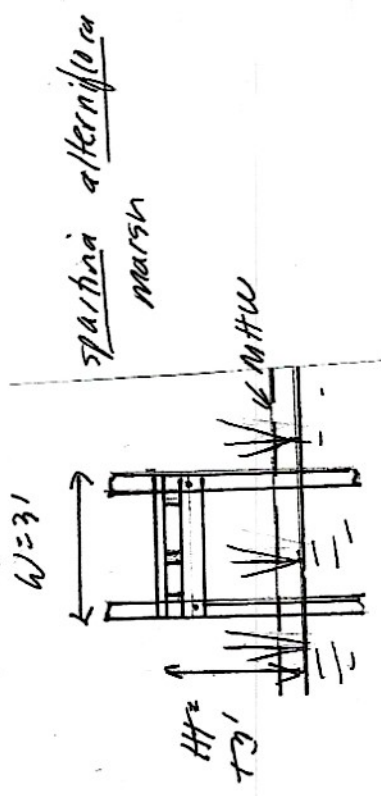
Plan view and cross-section sketches of proposed project. Sketches for permit application purposes only.
